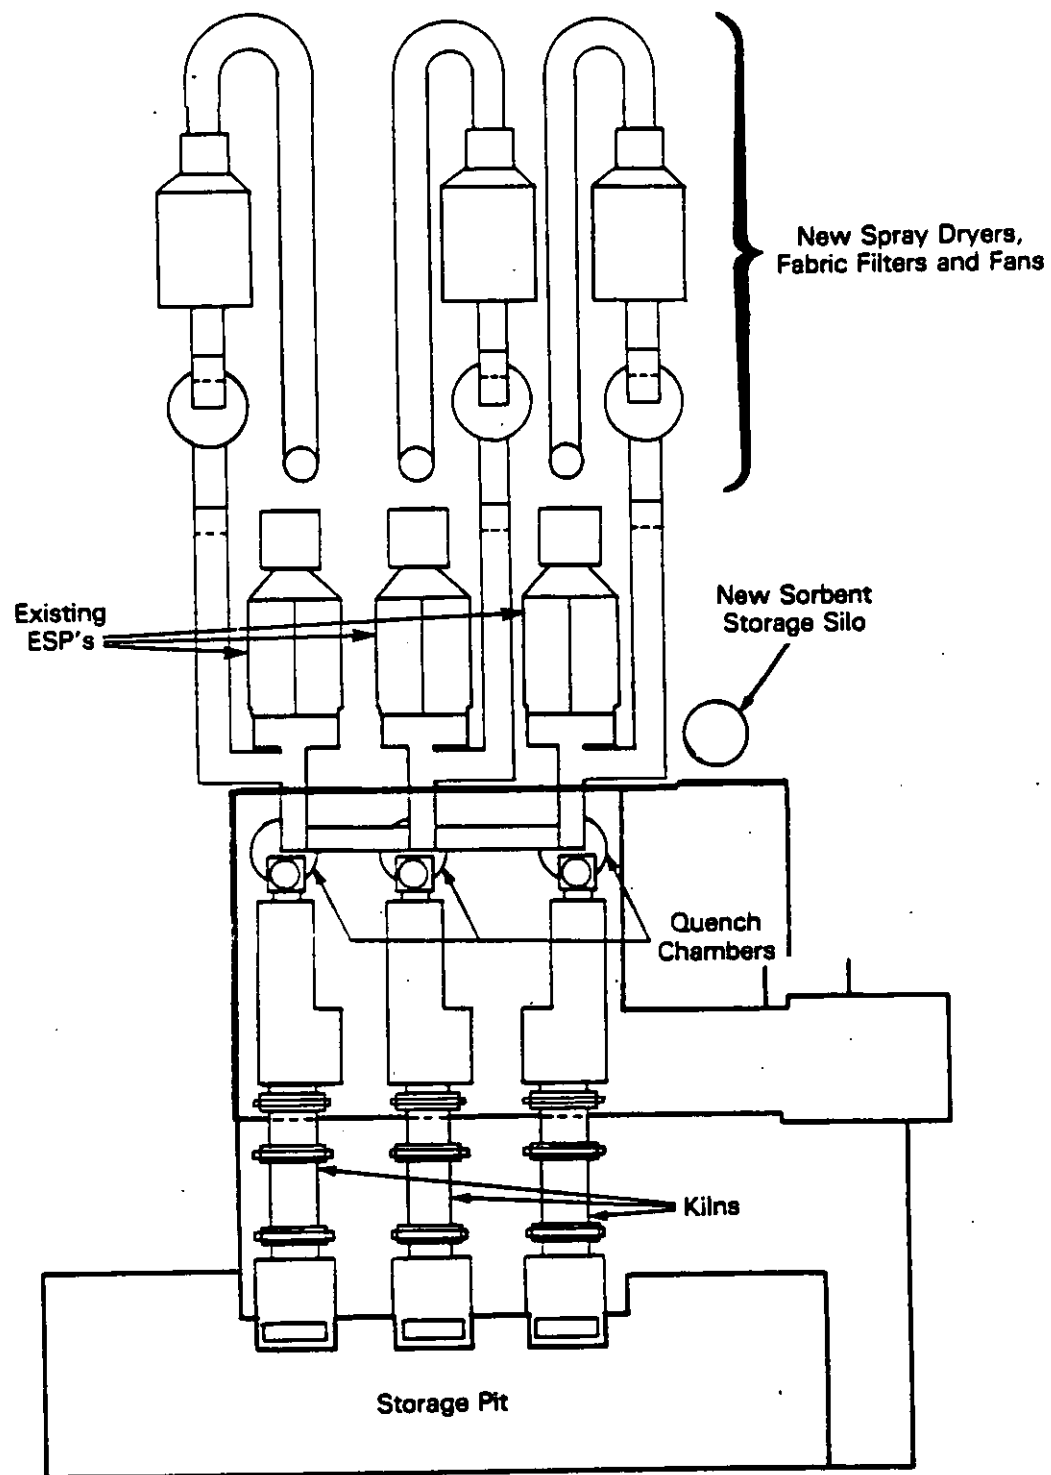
Plot Plan of Spray Dryer/Fabric Filter Retrofit Equipment Arrangement
